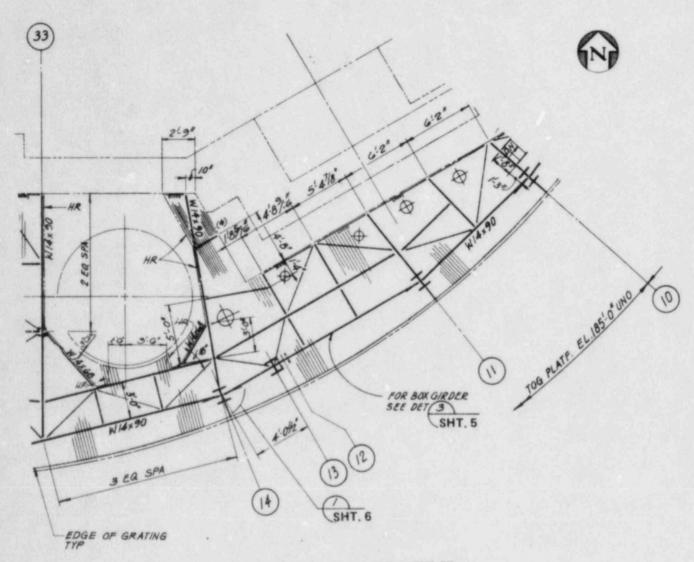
STRUCTURAL STEEL DESIGN DETAILS (Sheet 1 of 9)
